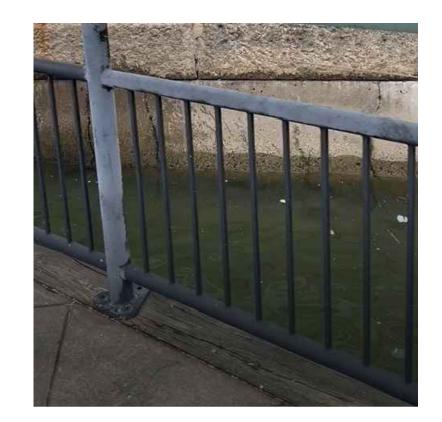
ENTRANCE RAMP NORTH ONE BOLT MISSED IN TEN COLUMN BASE PLATES
